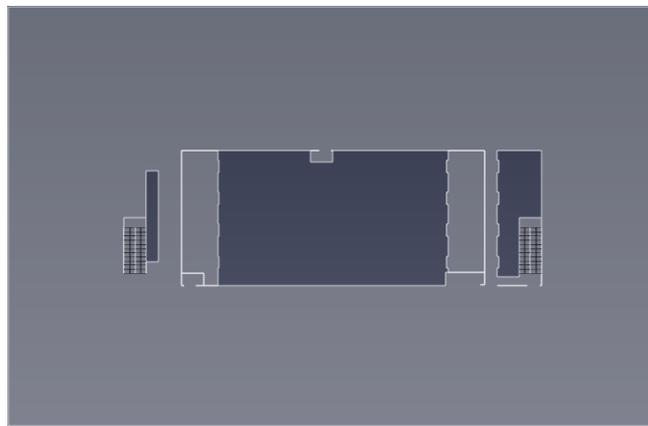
Schematic representation of a typical high-rise zone floor plan.
